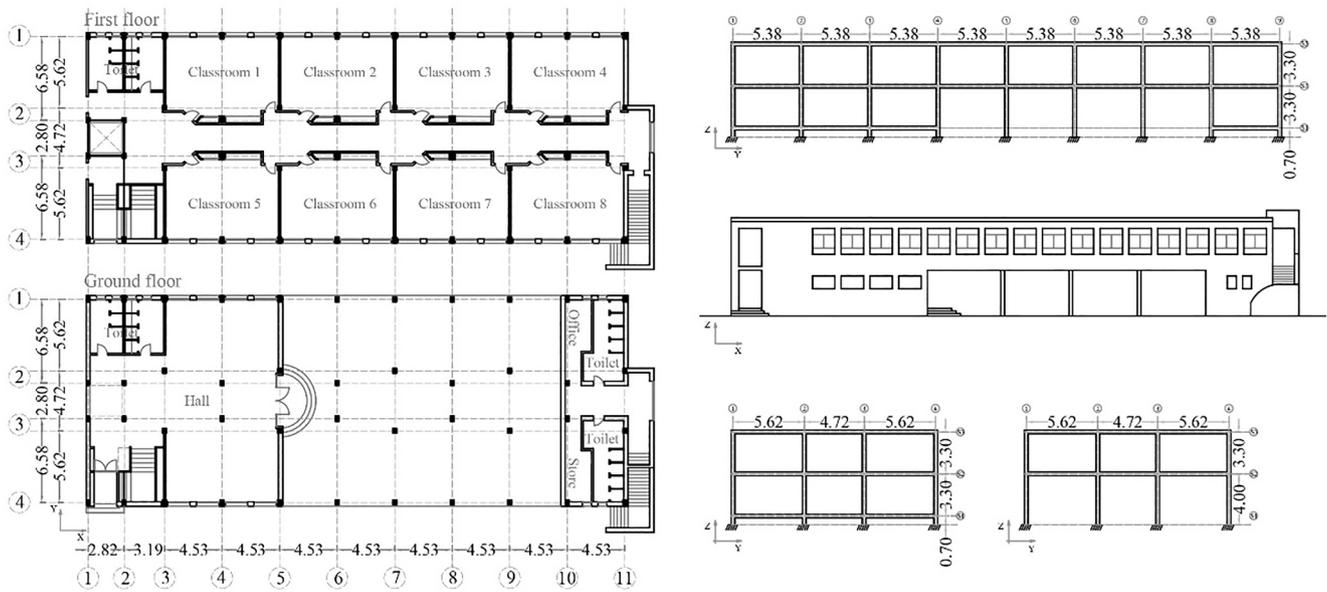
The school's distribution in plan and elevation. Elaborated by the authors.
